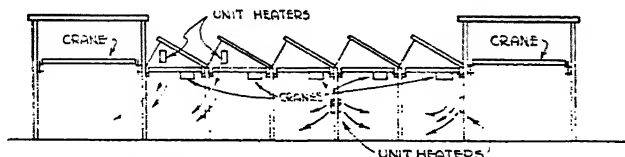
Cross-Sectional View of a Factory Illustrating Two Methods of Unit Heater Application
